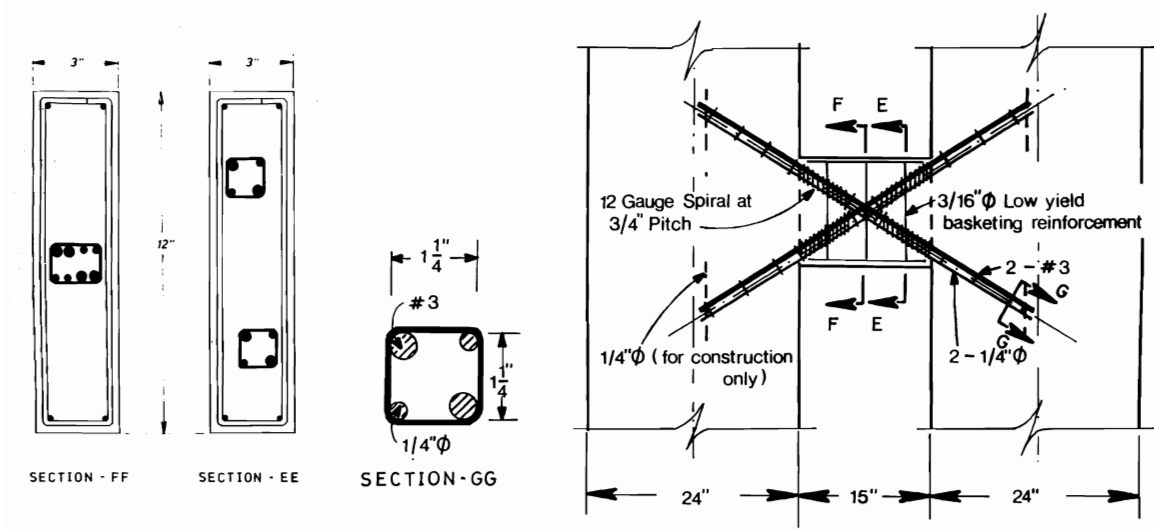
Wall pier reinforcement detail (Santhakumar, 1974)
